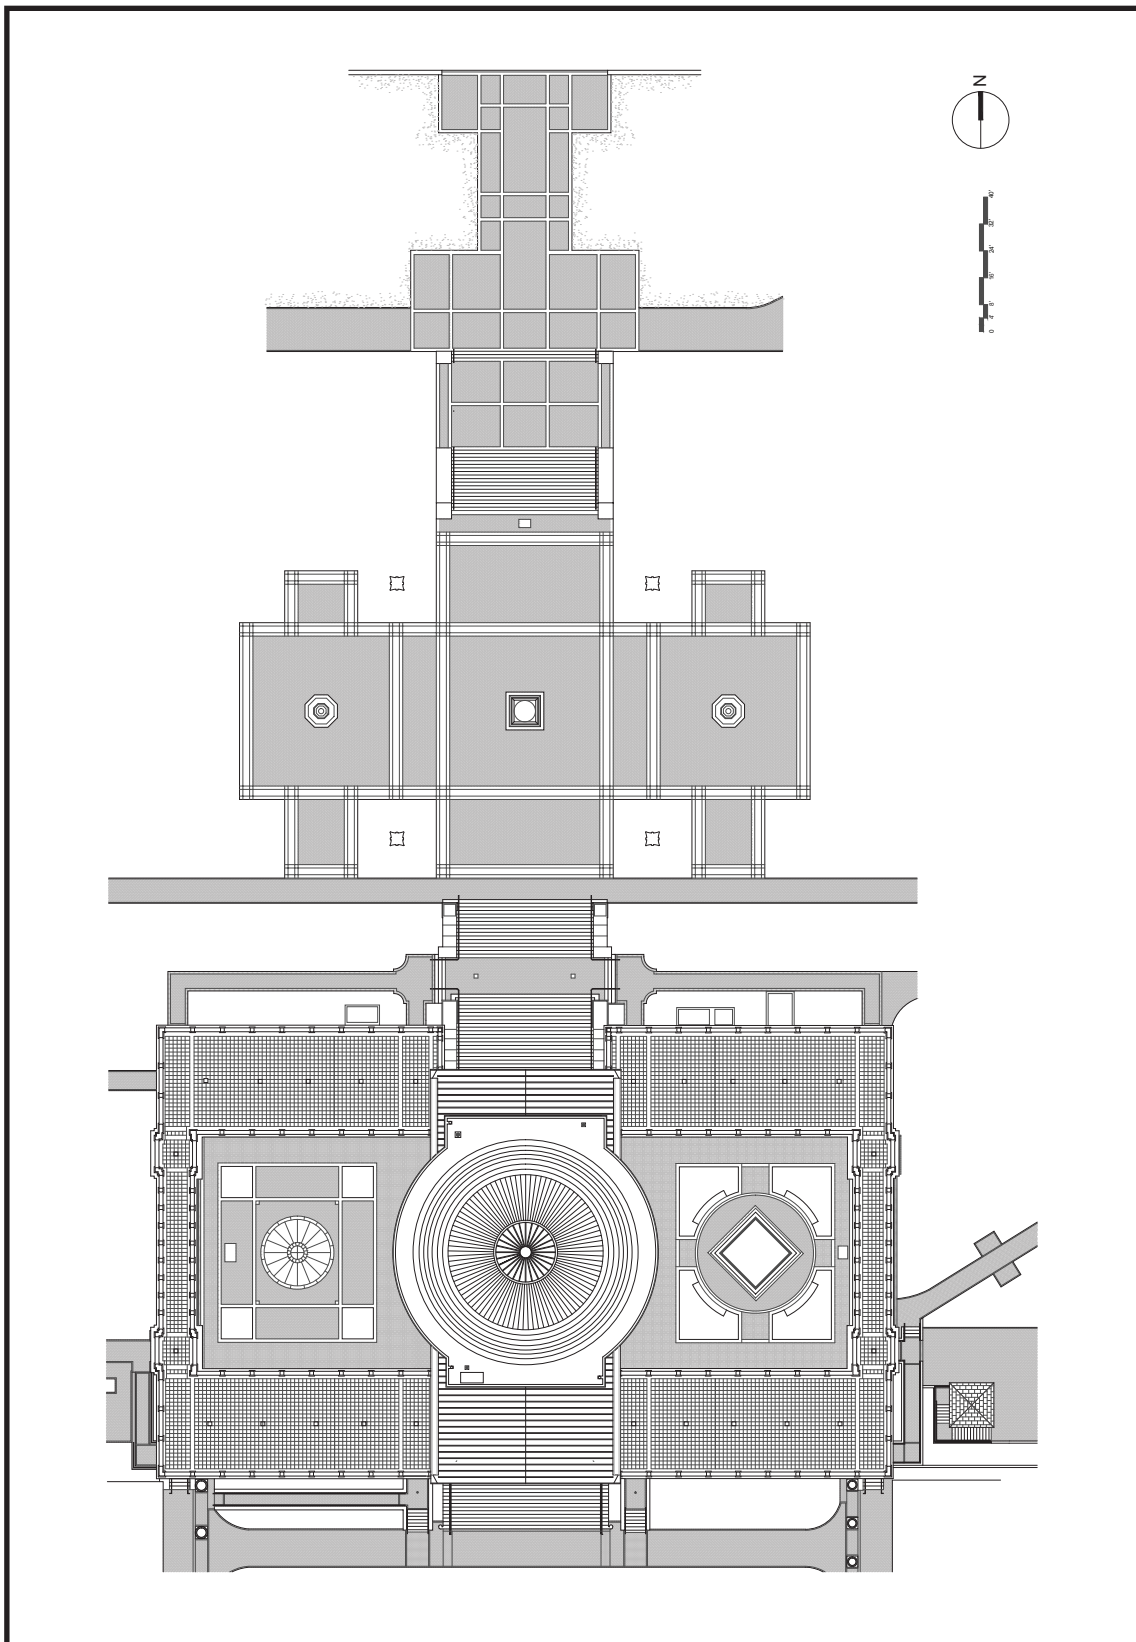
Site plan. Drawing by John G. Waite Associates, Architects, 2022.
